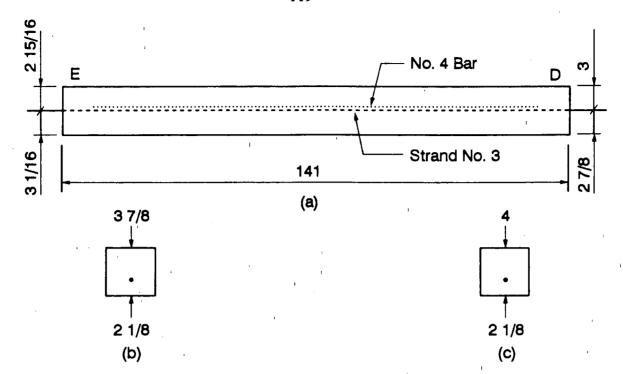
Specimen No. 17-6.0DC-11 (dimensions shown in inches):
